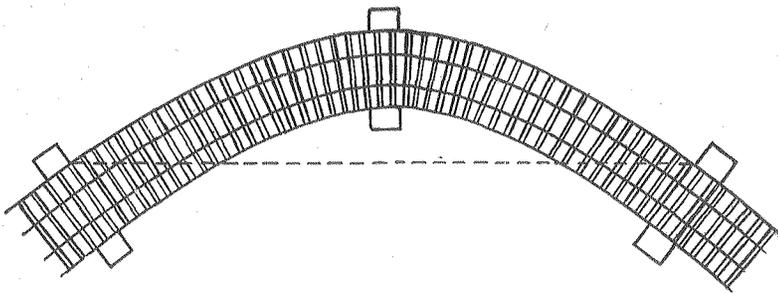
The Same Truss Supported by an Abutment in the Center
